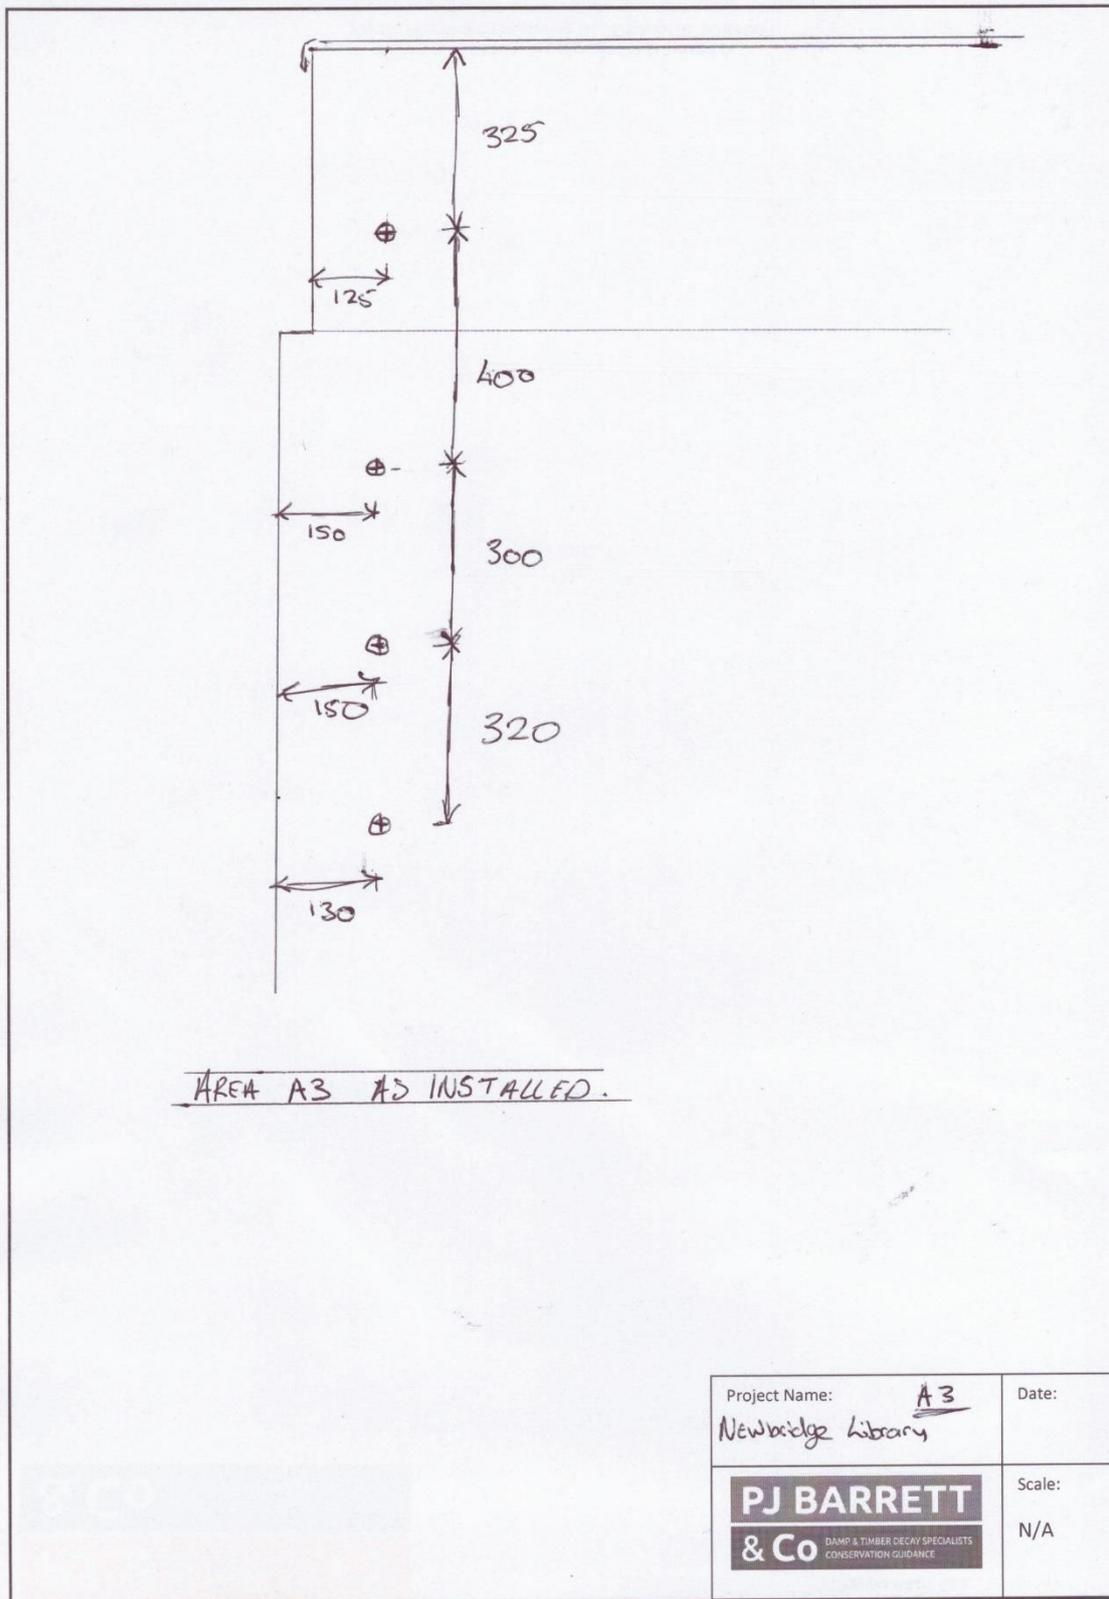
Showing a site sketch of the stitching works Detail A3 looking West.
